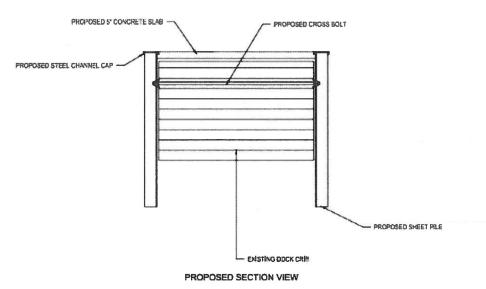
Section view of proposed dock encapsulation. (Courtesy of MJO Construction)
